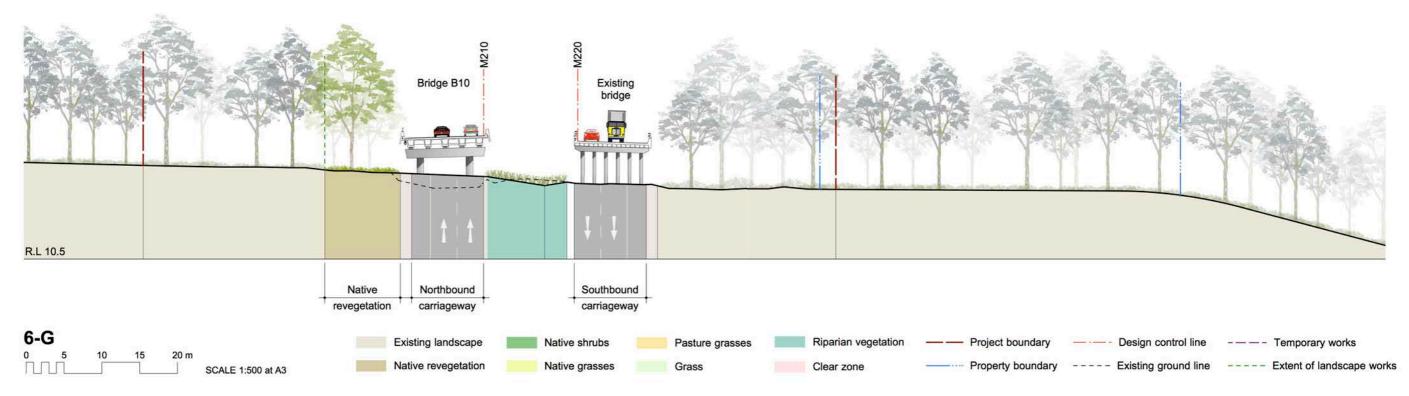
Section 6-G at Bridge B10 – Northbound bridge over Tabbimoble Creek
